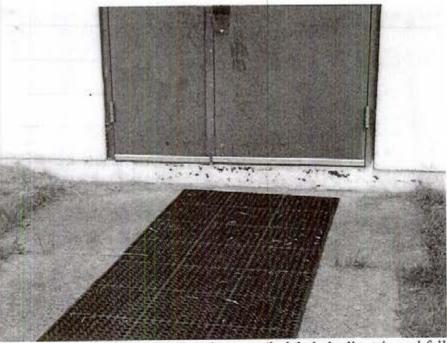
Entrance to Building, improperly labeled; slip, trip and fall hazard.
